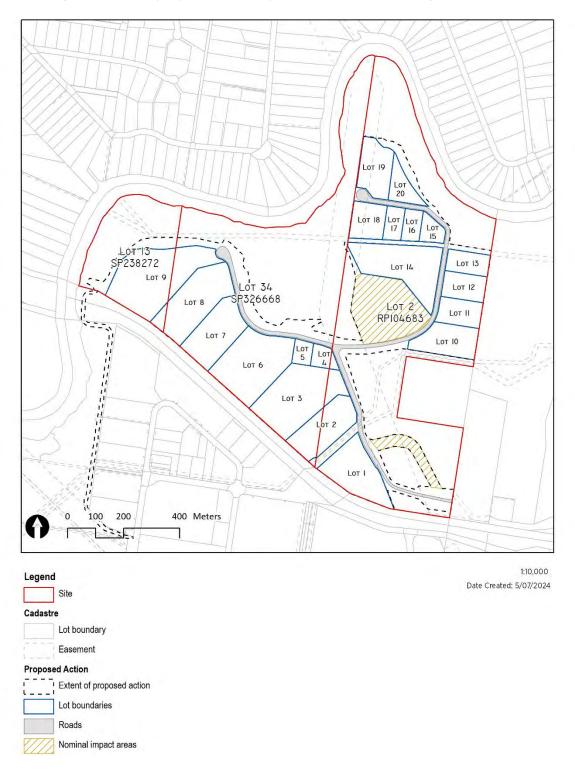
DEVELOPMENT FOOTPRINT/PROPOSED ACTION FROM WALKER CORP AND ARCADIS ENGINEERING PLAN ISSUE 02 (02.08.23).
